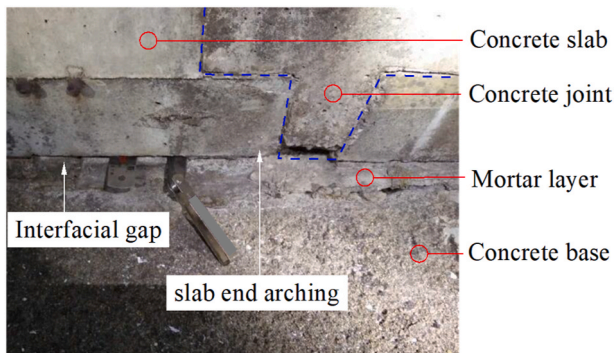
Actual photo of the longitudinally continuous slab track with damages like the interfacial gap between concrete slabs and mortar layers, and slab end arching.
